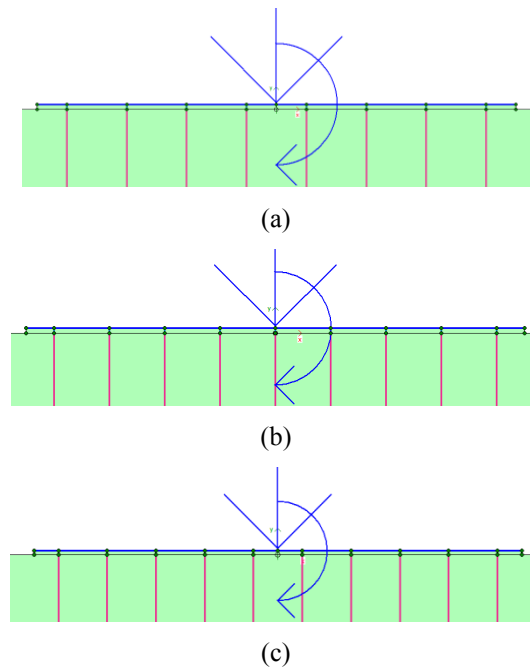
Modeling techniques for connection between piles and pile caps of (a) 8×1, (b) 9×1, and (c) 10×1 pile group.
